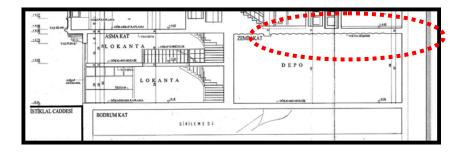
Floor arch on ground floor (taken from survey 1/50 scale A-A Section)
